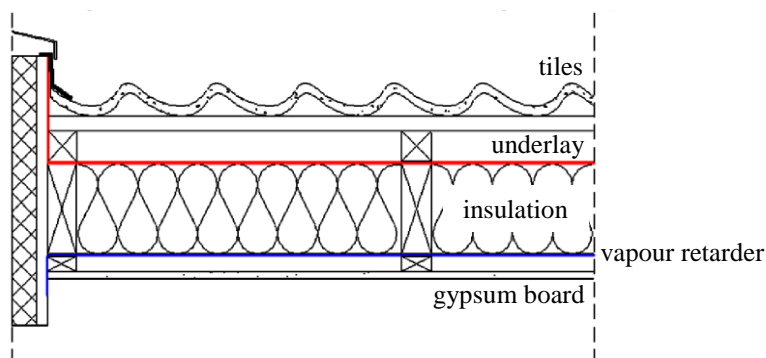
Roof construction with insulation between the rafters (and on top of the purlines)
